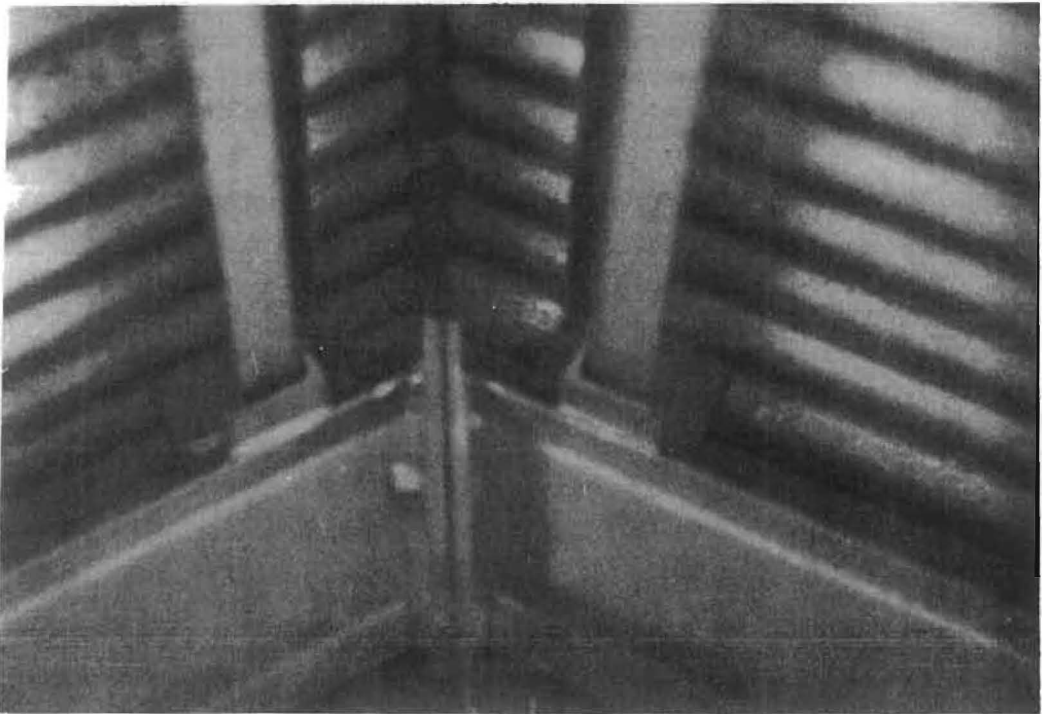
Internal view of the ridge line of the roof in the penthouse.
